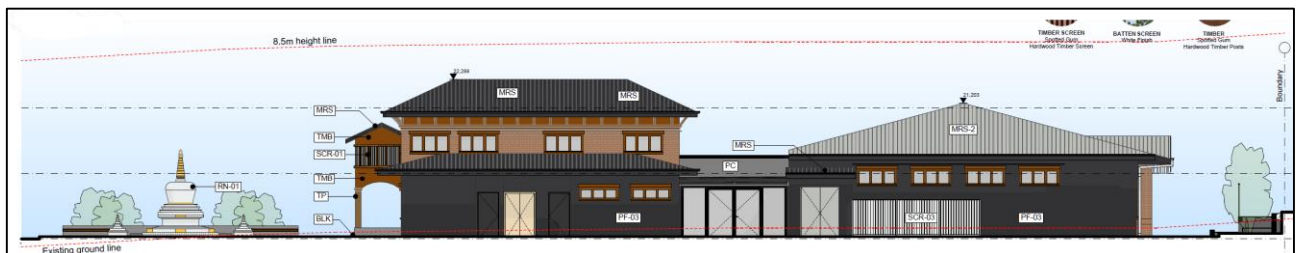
Proposed Plan of Development – Stupa and Temple Elevation
